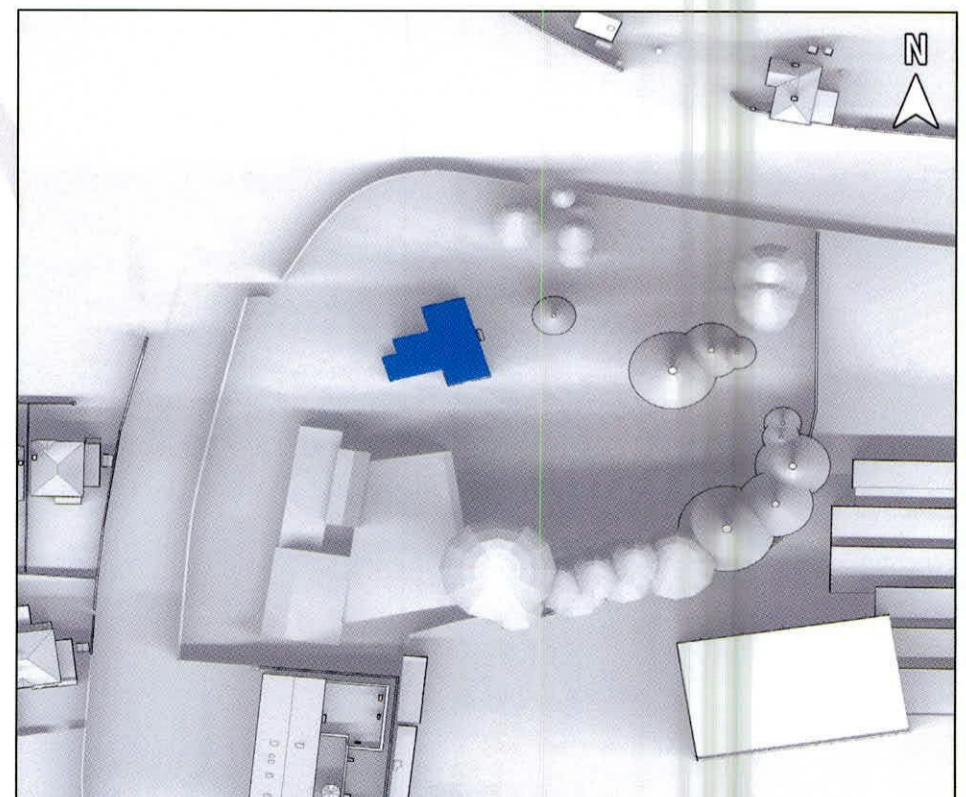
Floor plan of assessed building, Keyplan highlighting the assessed building (L).
